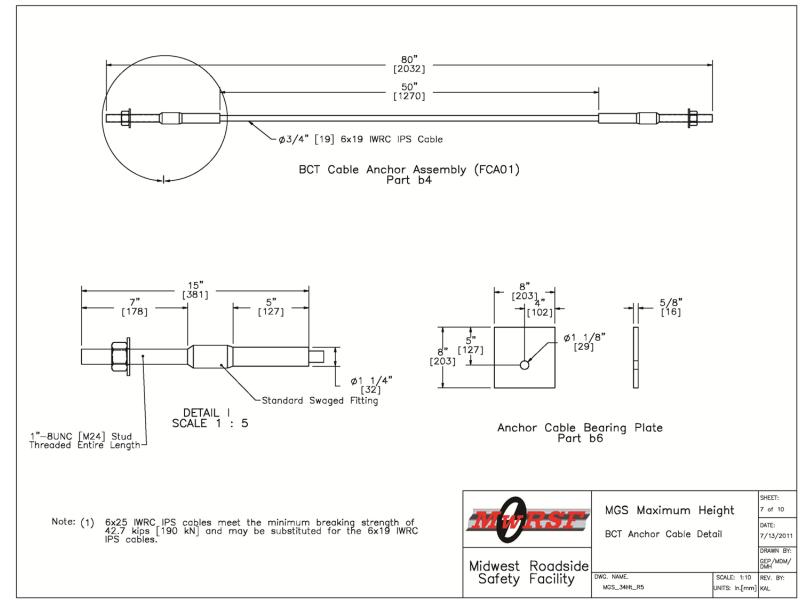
BCT Anchor Cable Details, Test No. MGSMRH-1
